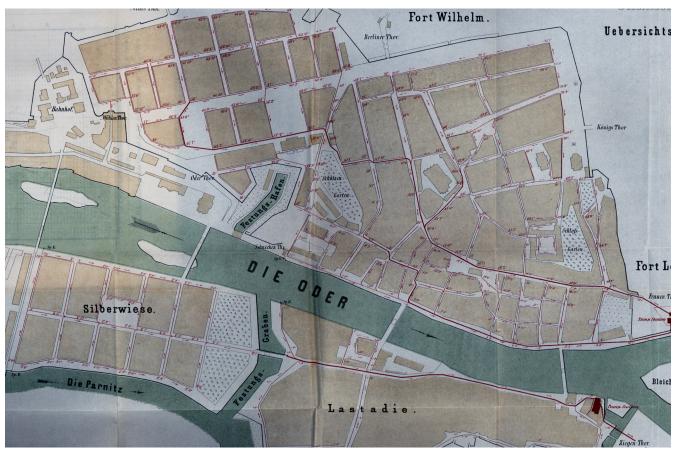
Drainage project of Szczecin developed by J. Hobrecht. After Hobrecht 1868, Plan no. 2.
